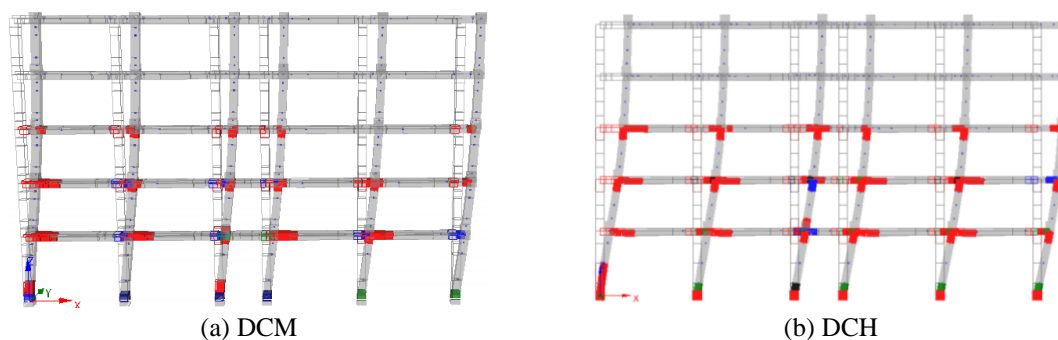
Damage of the structure, Montenegro earthquake (aftershock) - Budva
